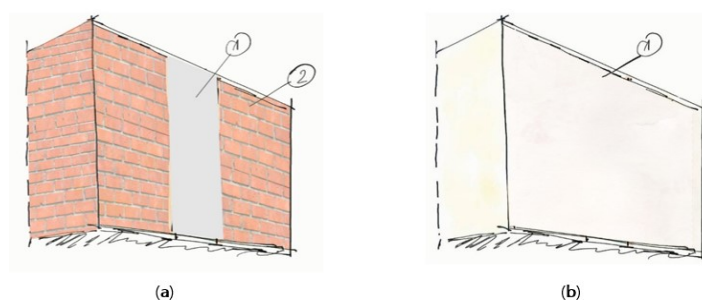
Conceptual drawing of a non-retrofitted façade of a 1971-1990 Portuguese residential building: (a) prior to the painting and (b) following the painting: 1 – Concrete column; 2 – Masonry wall; 3 - Wall finish.
